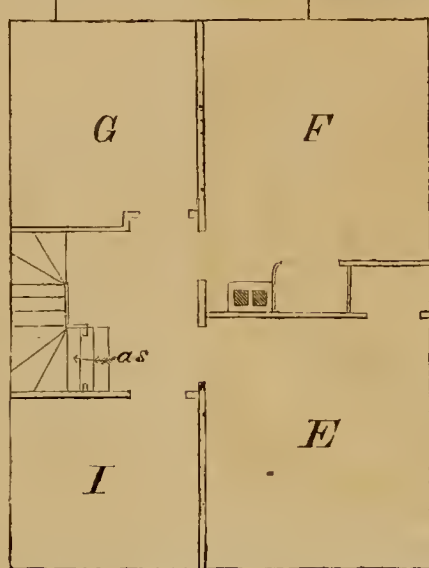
PART OF THE SECOND STORY OF A SMALLER HOUSE, (21 x 23,) WITH ATTIC STAIRS.
